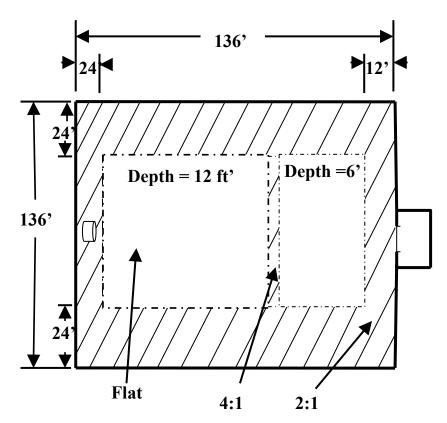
G.3-2 Plan View of FAA 1:1 Pond at the Top of the Permanent Pool Volume.
